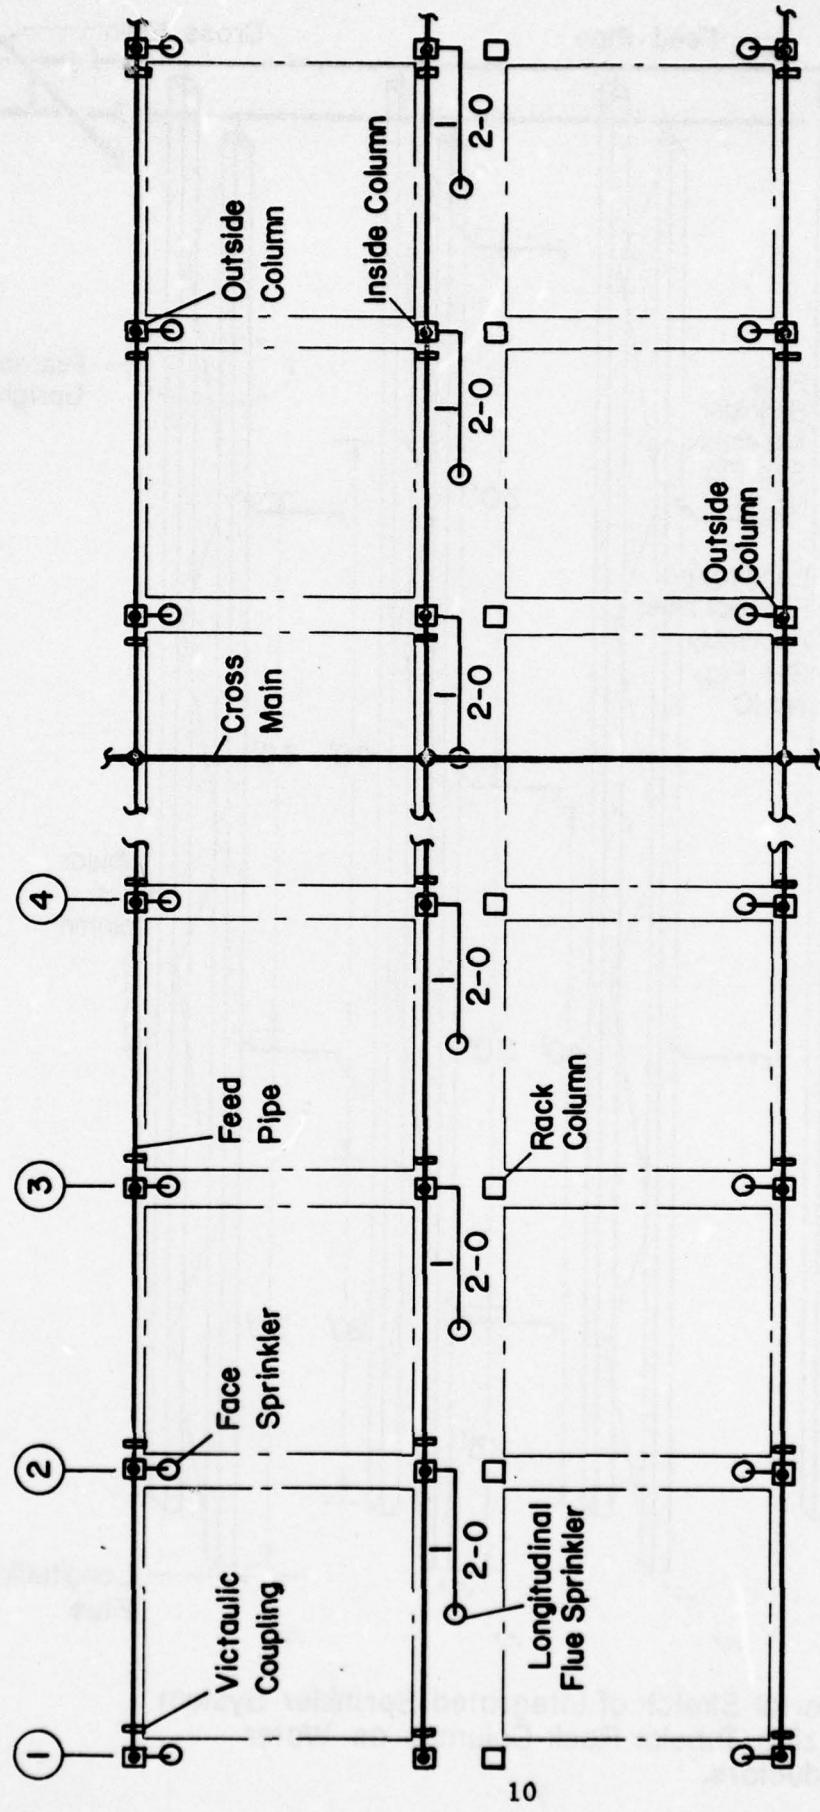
Partial Plan View of Integrated Sprinkler System Utilizing Tubular Rack Columns as Water Conductors in a Double Row Rack Structure.
